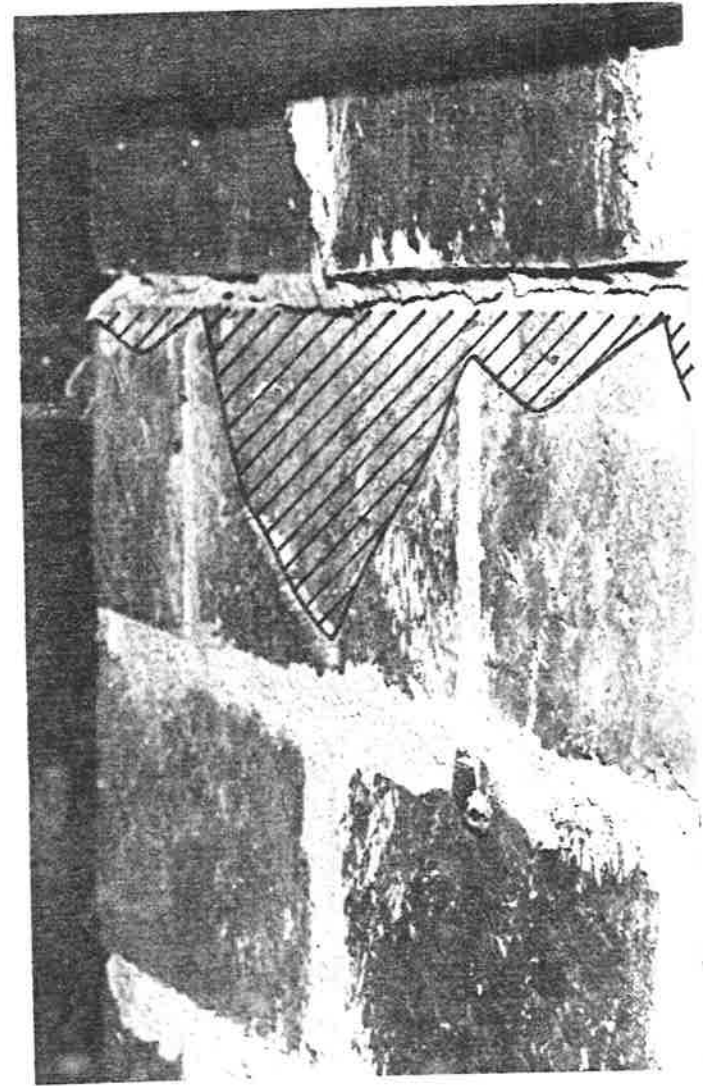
Spalling Failure (Wall 8)
